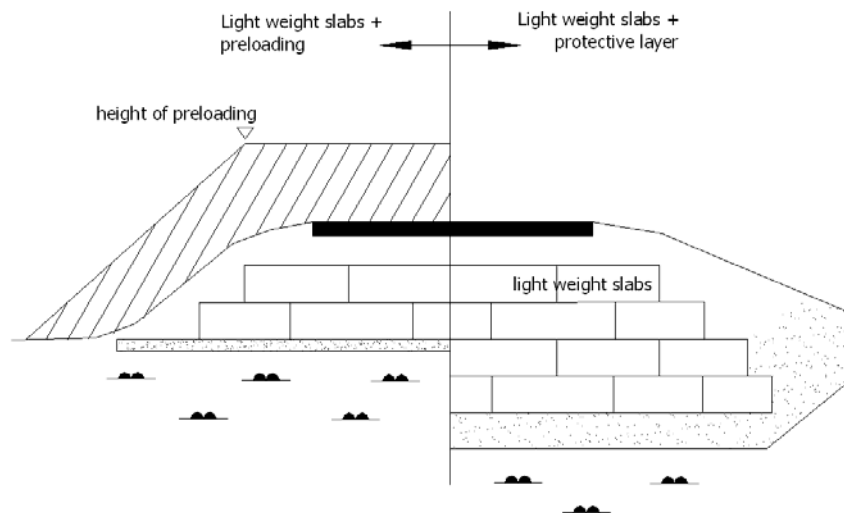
Example of combined embankment construction on soft ground with and without overloading
